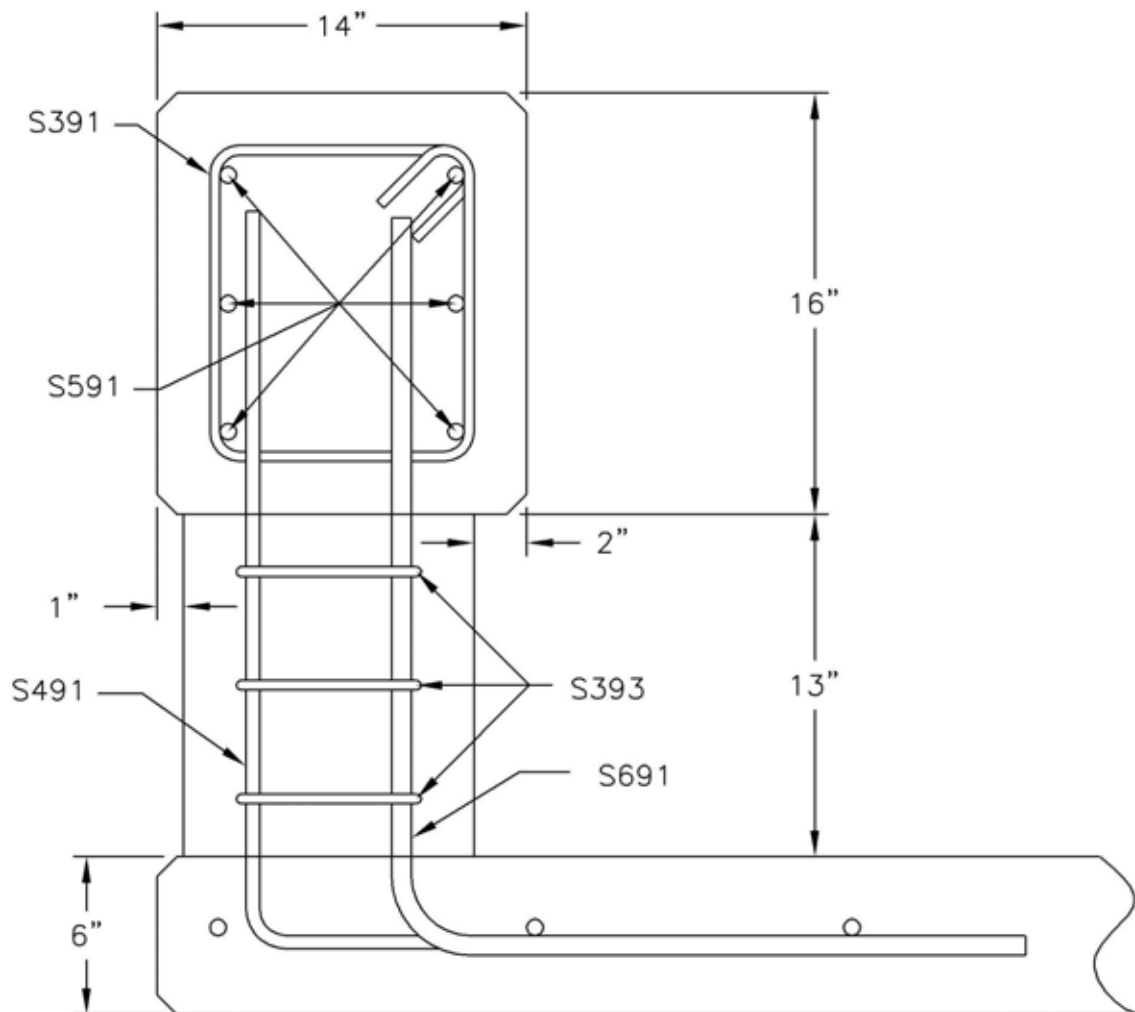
Layout for Open Concrete Bridge Rail Attached to Inverted Tee Bridge Deck System (English)
